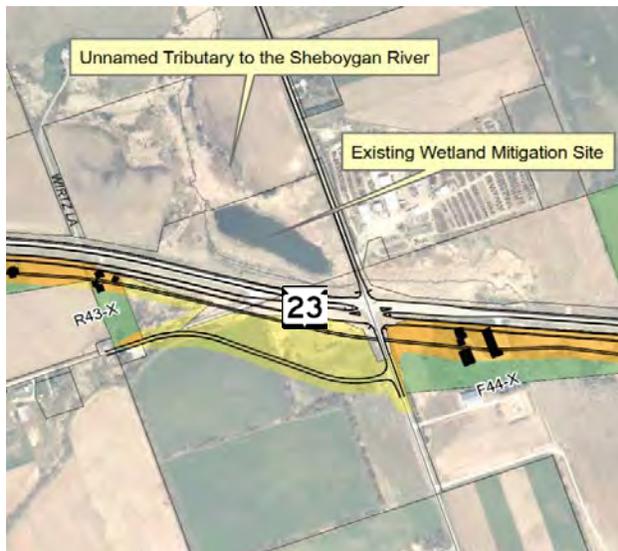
B-8.4 Pit Road Site—4-lane On-alignment and Hybrid Alternatives
